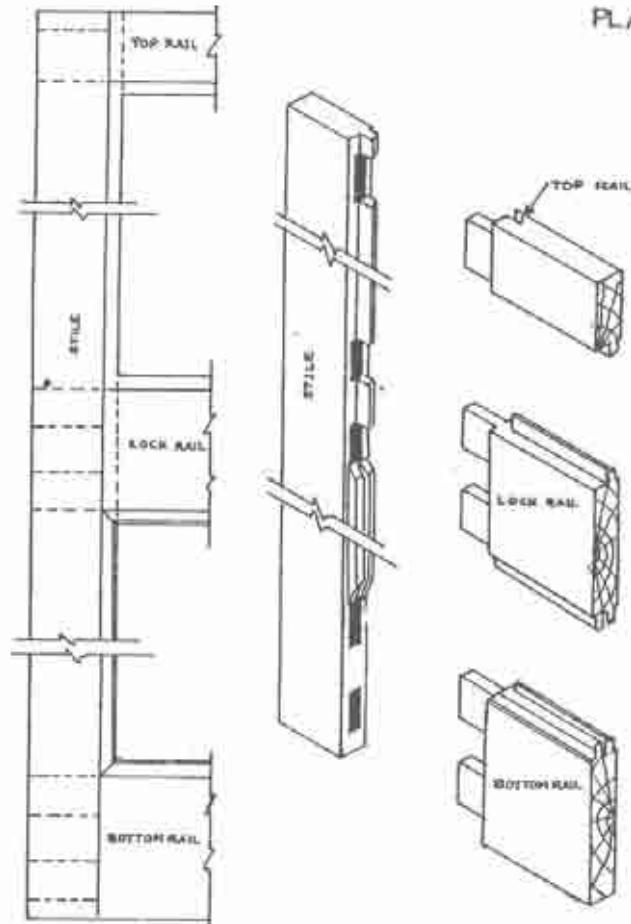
DETAILS OF TYPICAL JOINERY BETWEEN RAILS AND STILES
